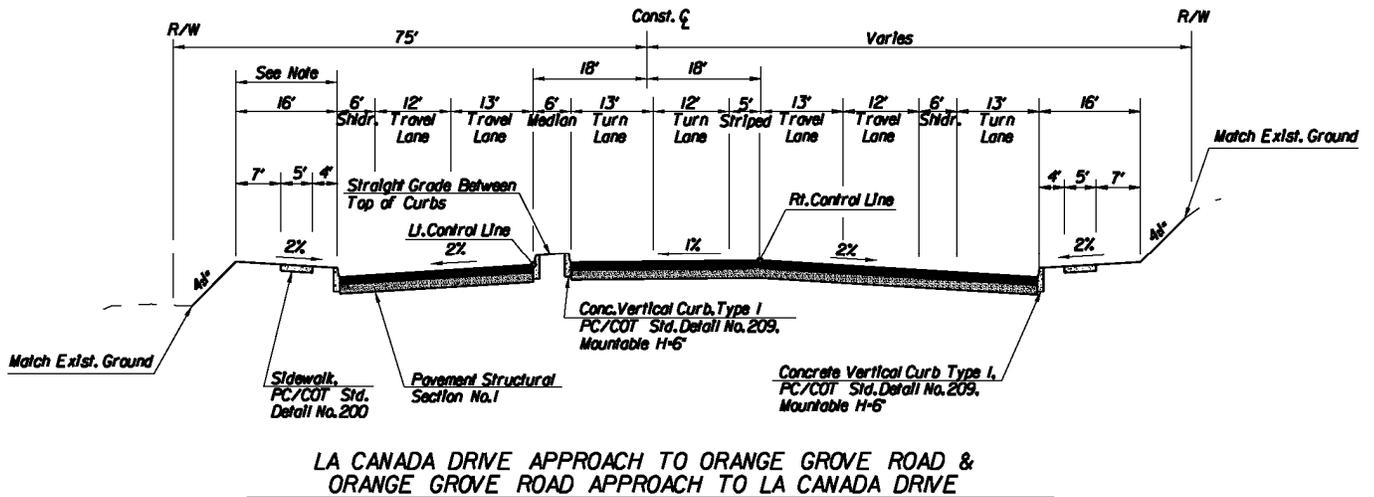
Typical cross sections for La Cañada Drive and Orange Grove Road, showing approaches and departures
